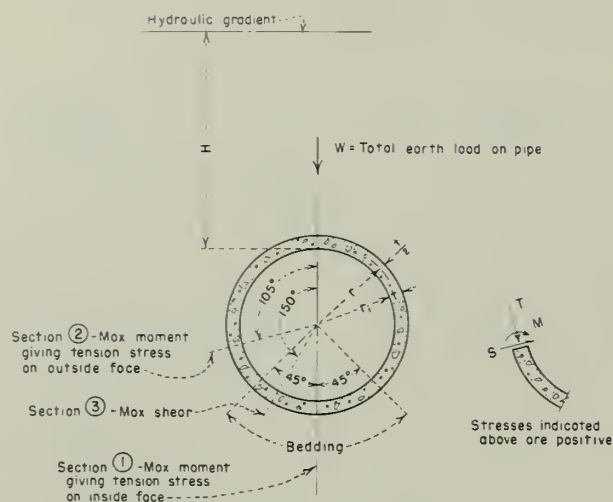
Location of critical sections in design of precast concrete pressure pipe.
